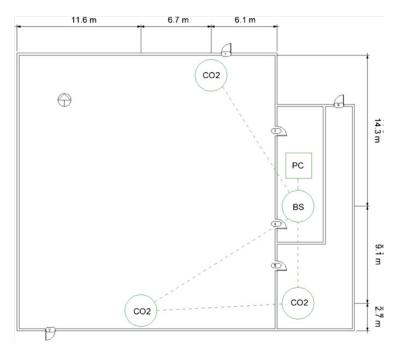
Gymnasium Floor Plan and Sensor Layout (Ng et al., 2011)
